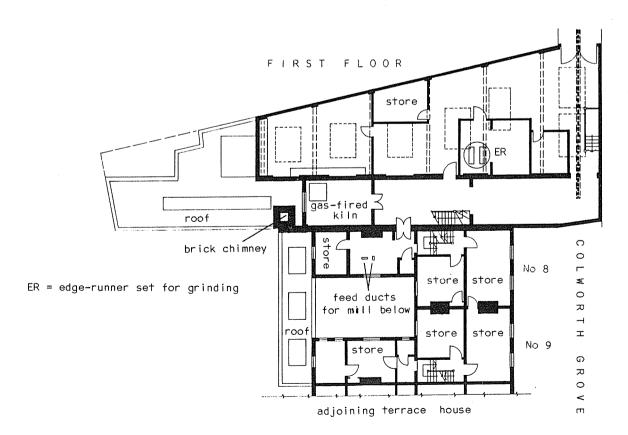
Plan of the first floor of 8/9 Colworth Grove. Drawn by Rosalind Pilling
